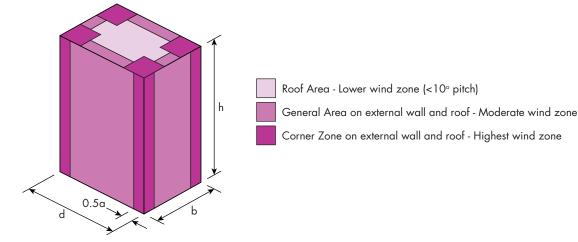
Typical Simplified Wind Zones on a Building Combination external plus internal wind pressures (for stud framing) Simplified to 2 zones
